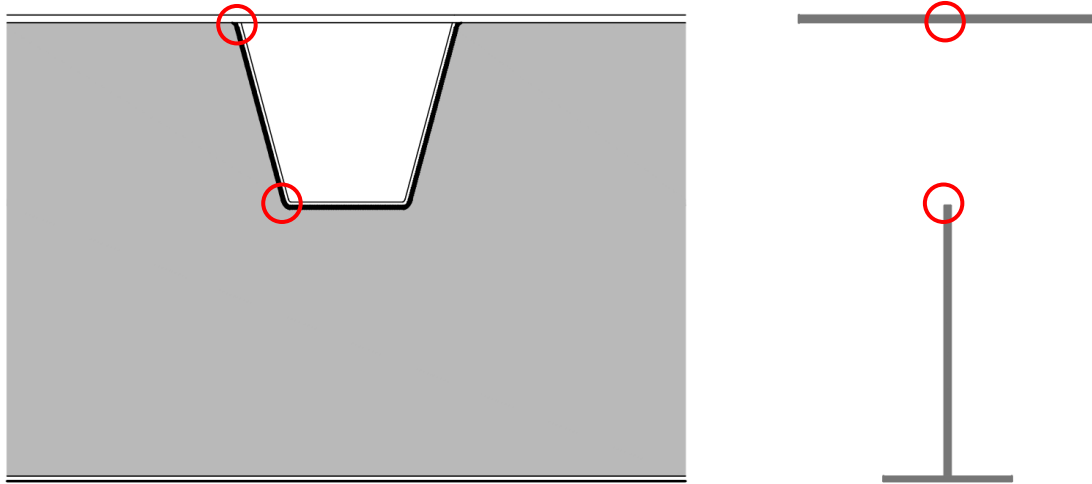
Effective cross-section of floor beam at intersection with longitudinal rib
